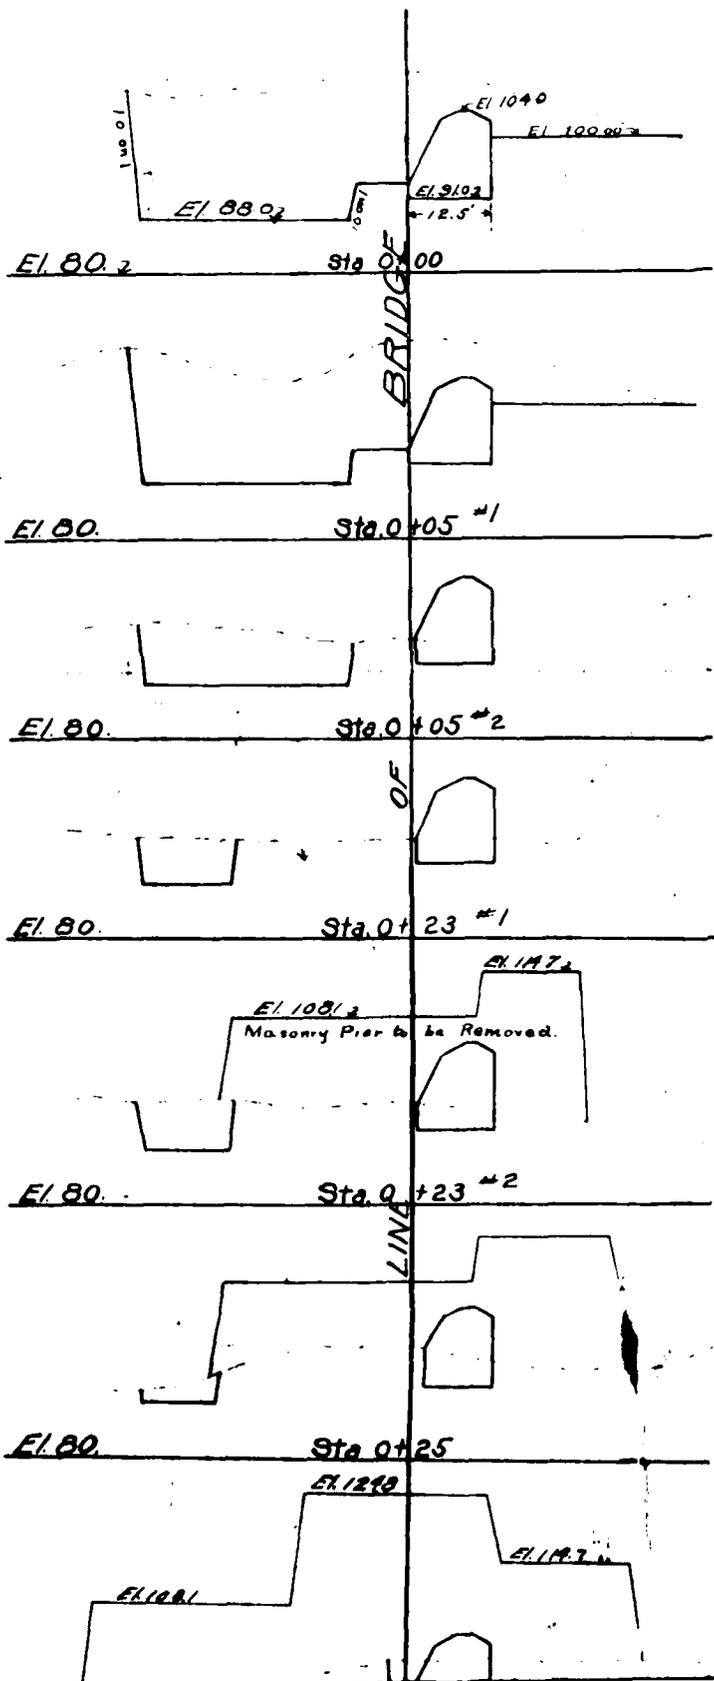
### DETAIL PLANS OF DAM 5, BRIDGE PIER, ABUTMENT ETC.
